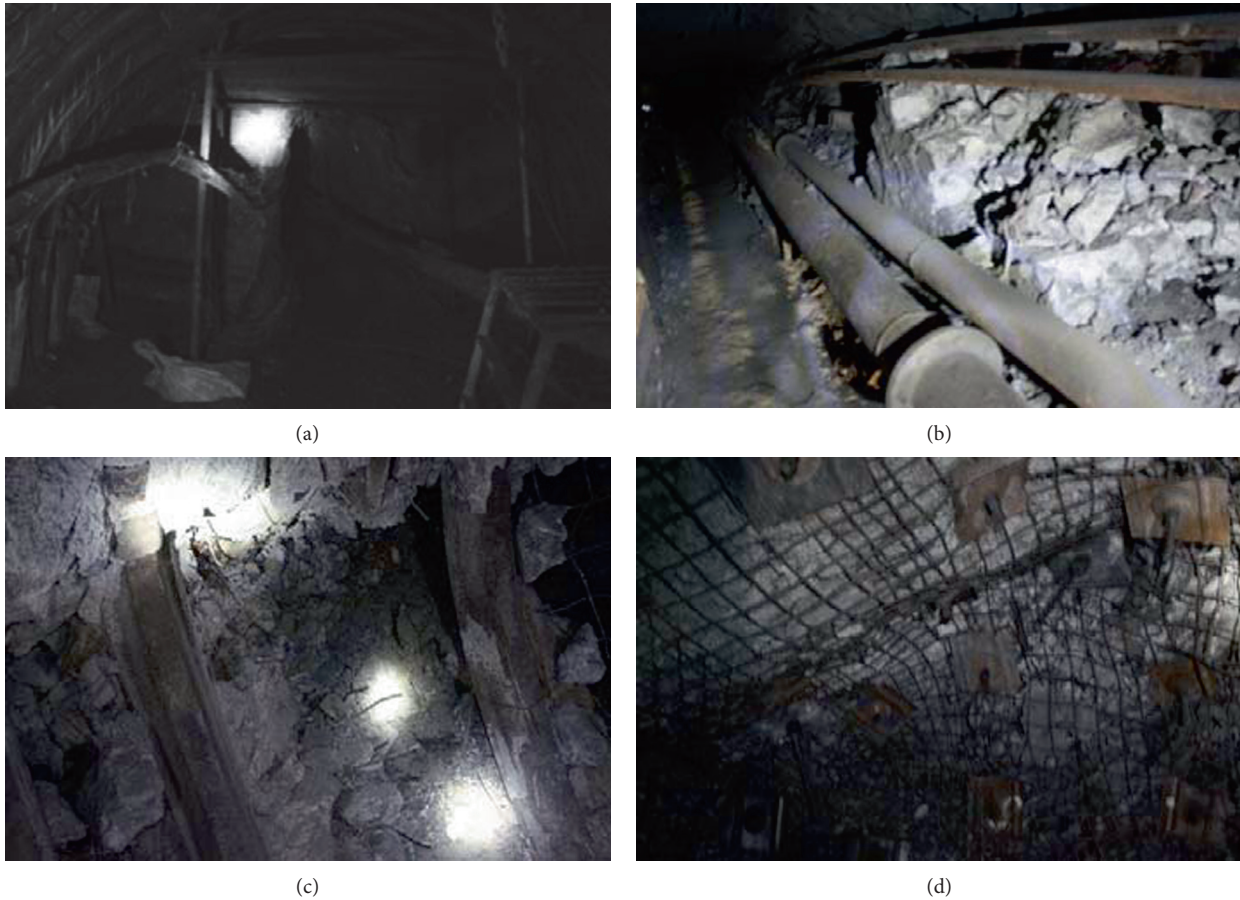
Roadway deformation figure under original support. (a) Section deformation. (b) Large deformation of section. (c) Broken surrounding rock. (d) Pallet bending.
